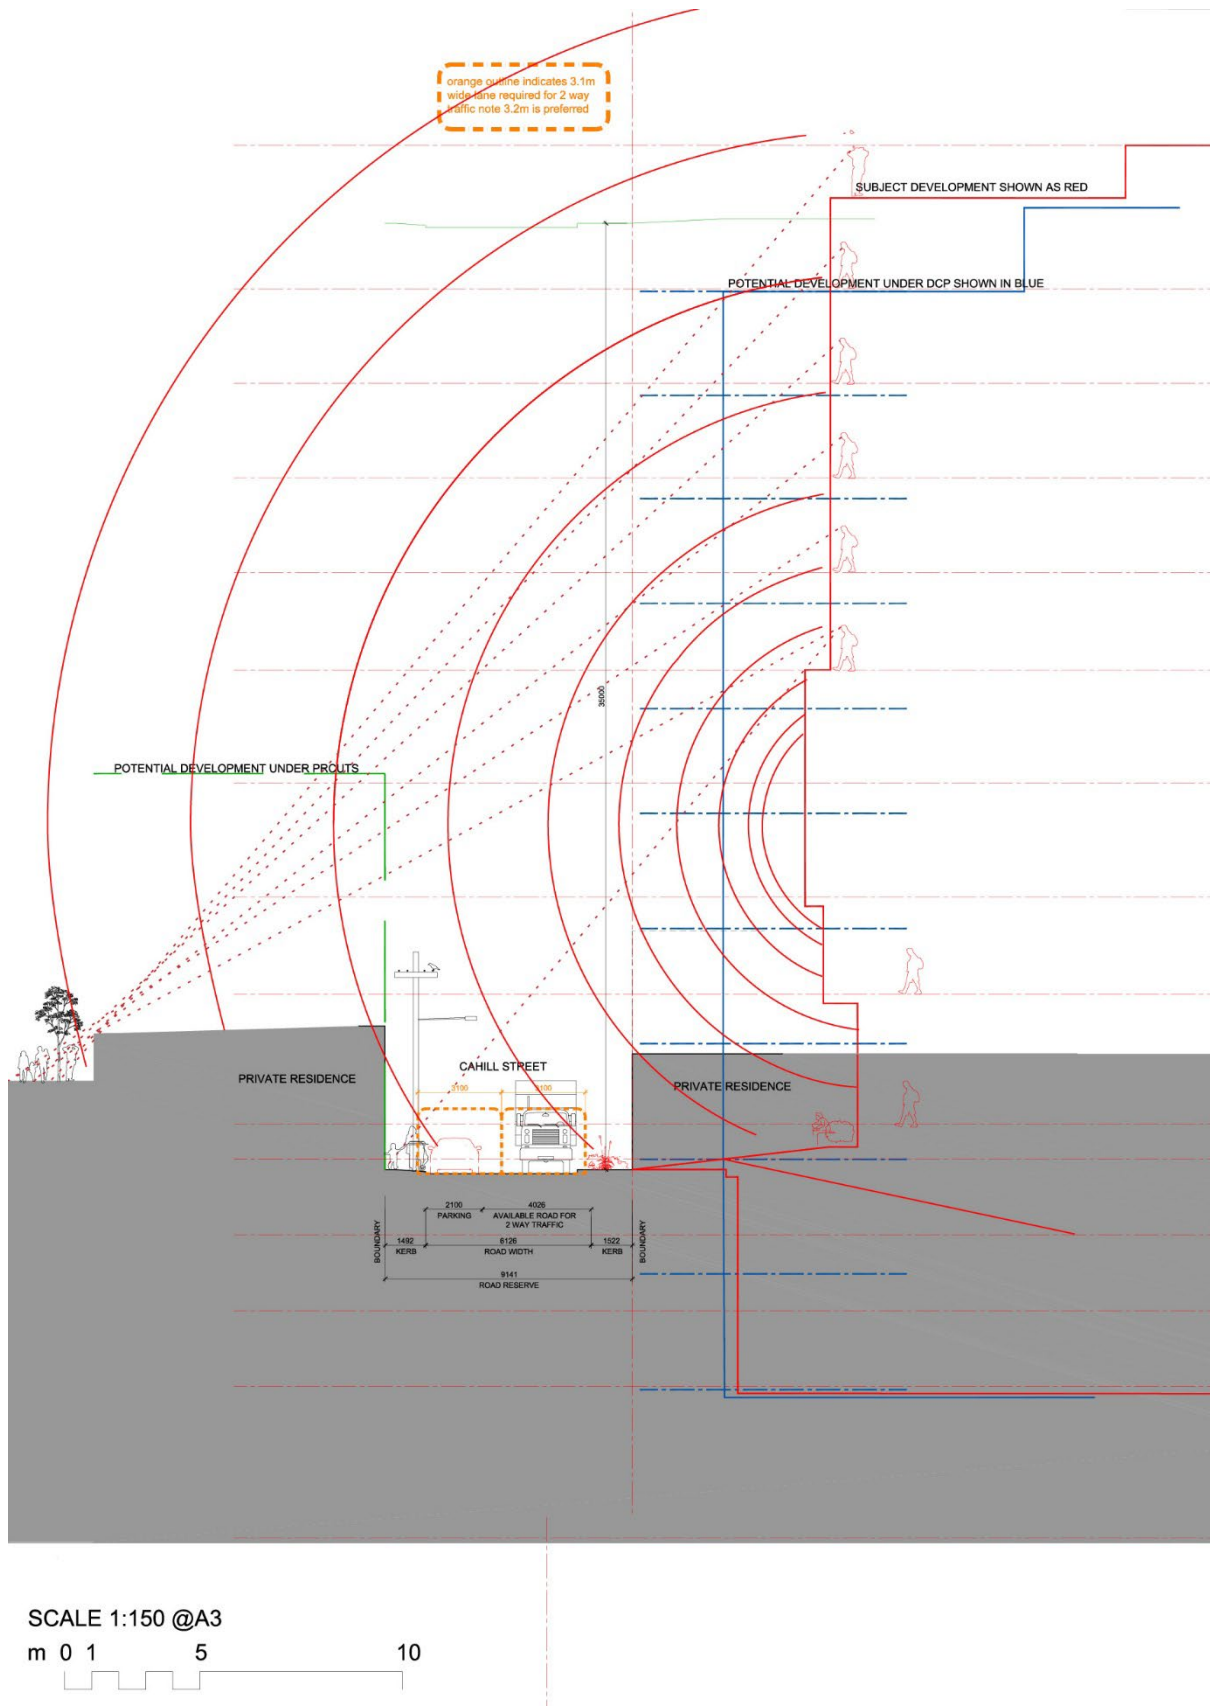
Road section at Cahill Street and proposed development illustrating increase in bulk and scale overlooking private residential property
